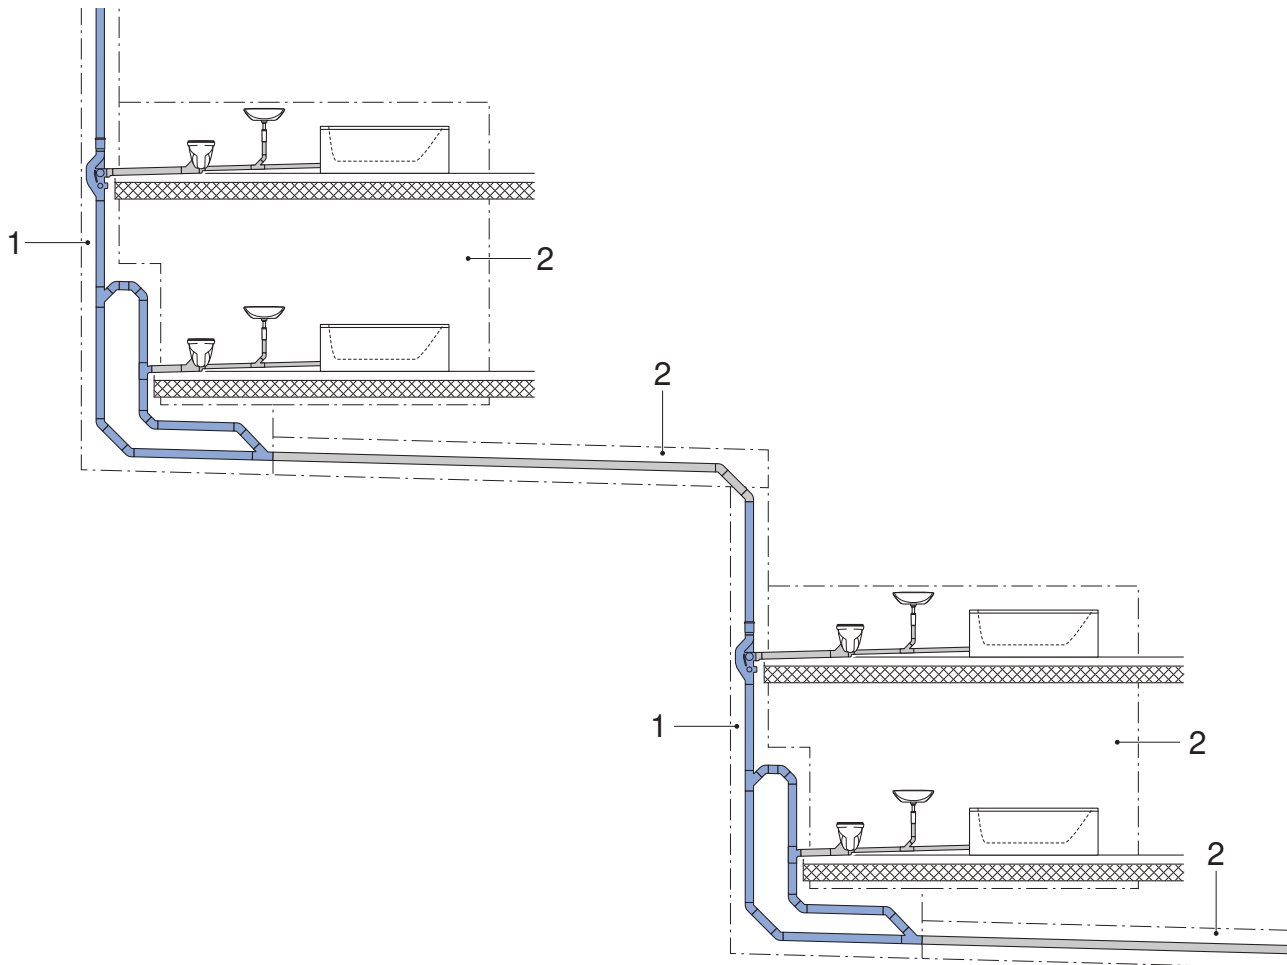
Discharge pipe with Geberit HDPE Sovent d160: pipe sections and rules
